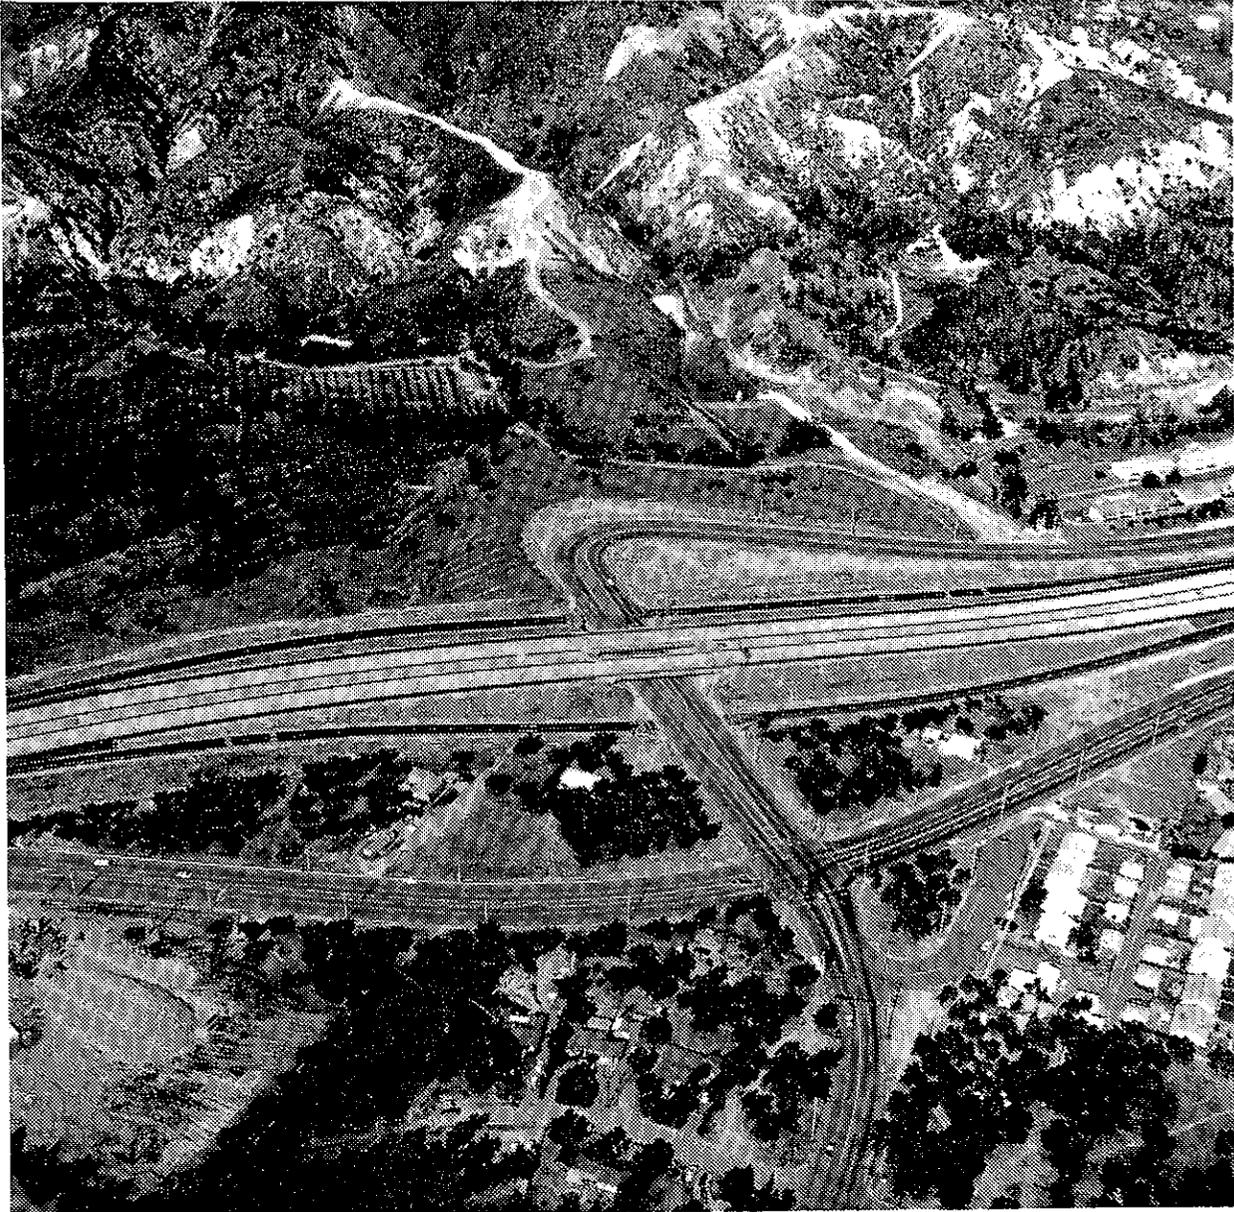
Looking northerly at the Roxford Street Undercrossing.
